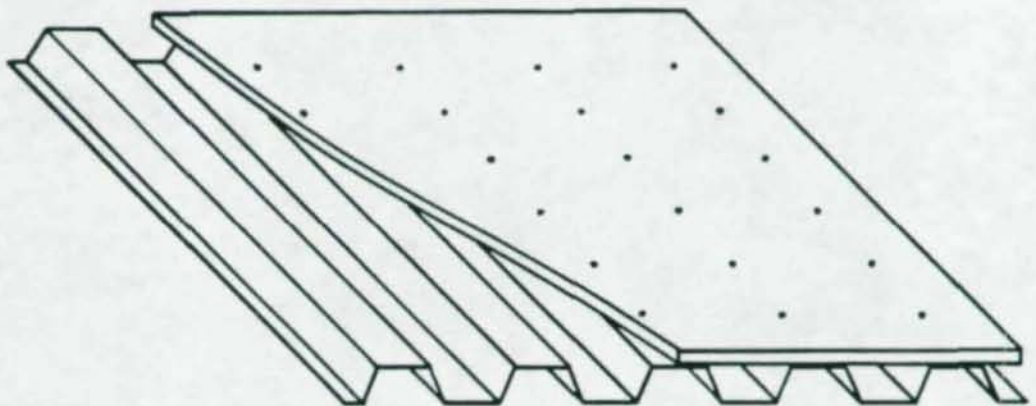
PROFILED STEEL DECK/DRY BOARD COMPOSITE FLOORS
